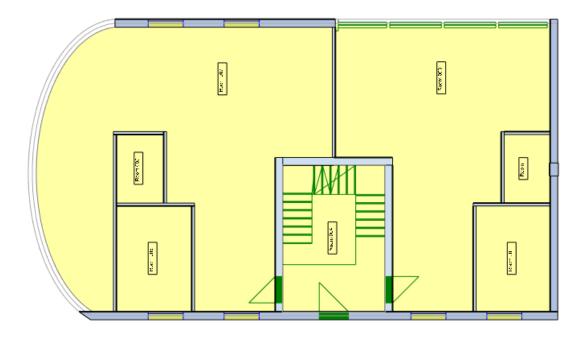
Plan view of the model converted in HottCAD (first floor): The curved wall and curtain wall are missing while the column is present.
